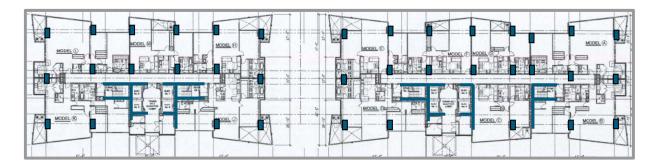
Column and Shear Wall Layout for Typical Apartment Level
